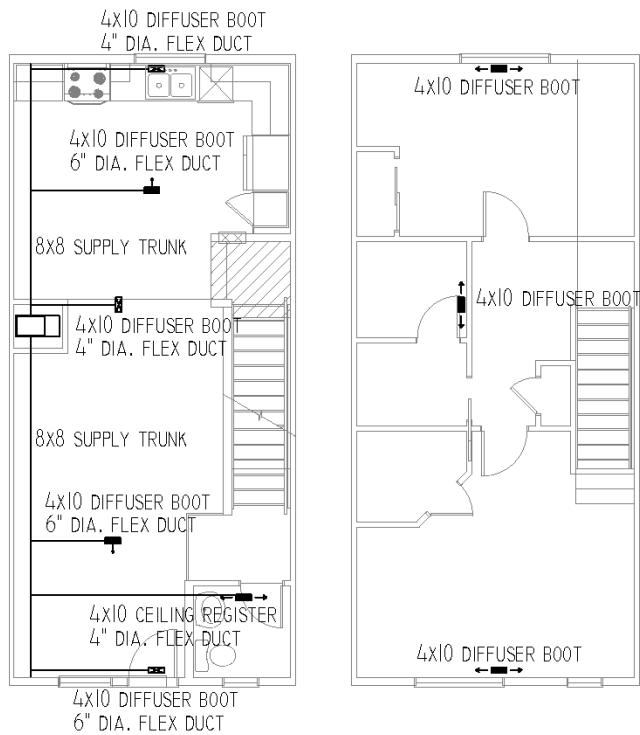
Traditional trunk-and-branch system layout (not to scale)
